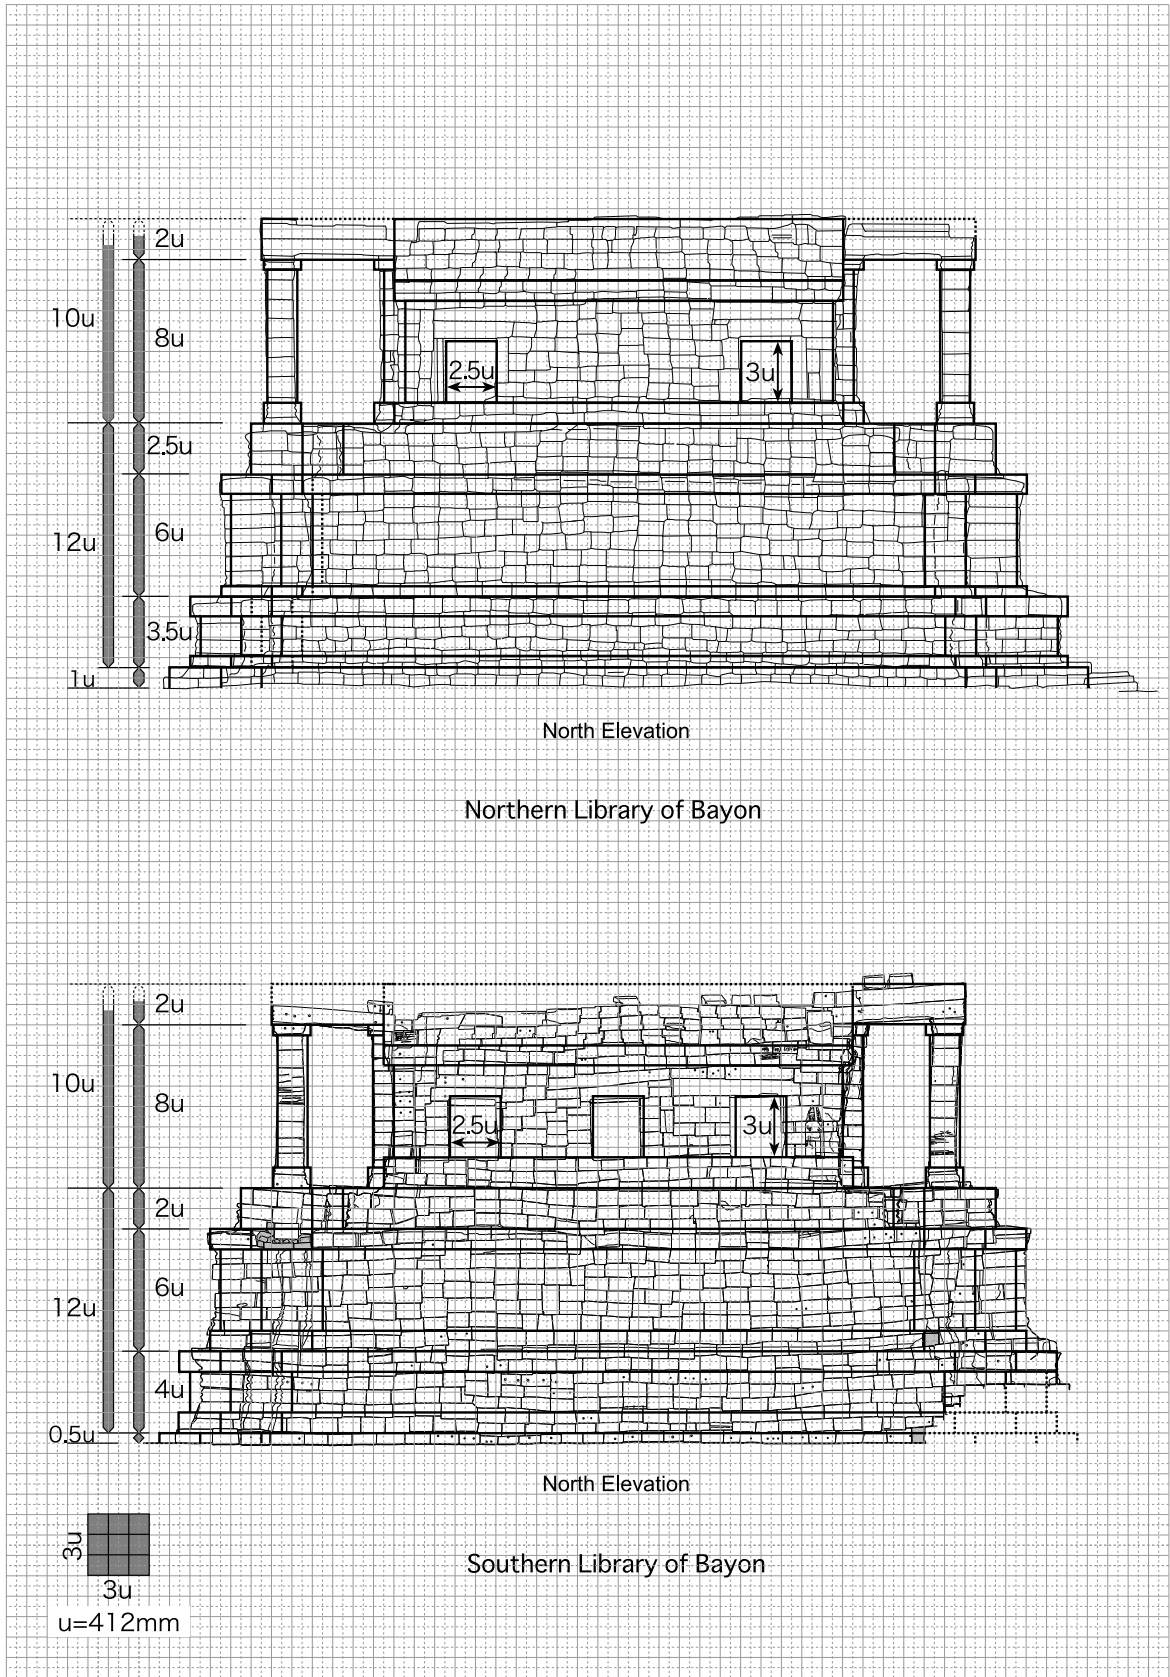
Abstraction of plan of measurements in elevation of Libraries.
